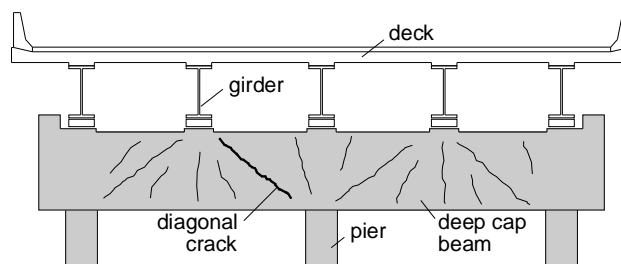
Typical crack patterns in deep bridge pier caps.
